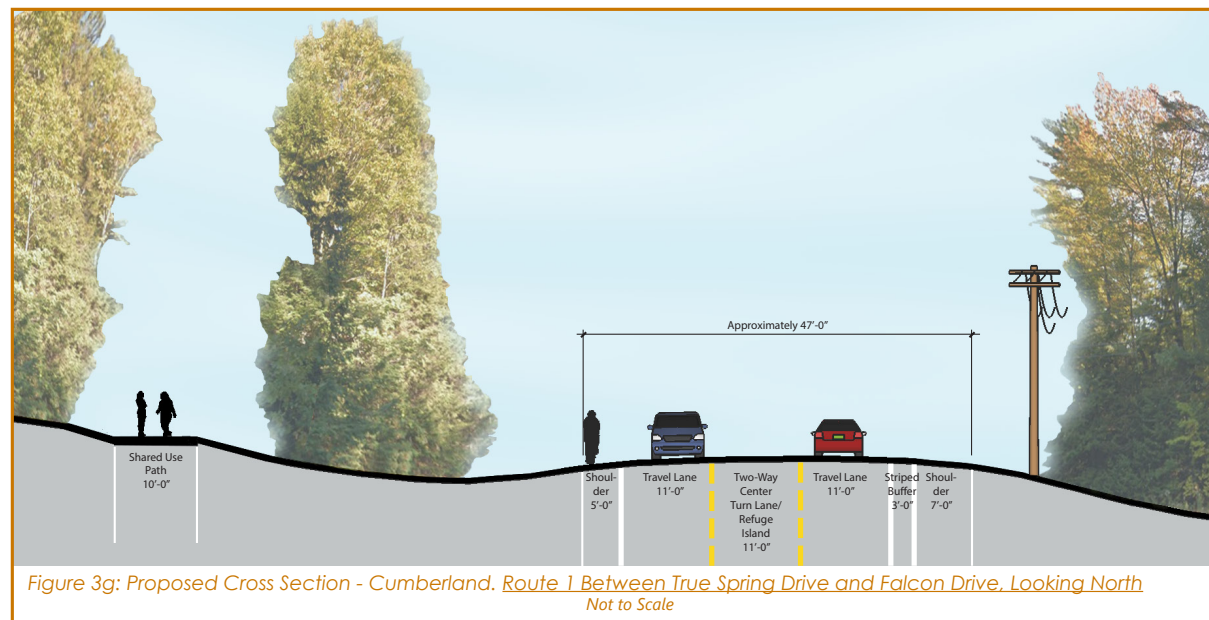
Proposed Cross Section - Cumberland. Route 1 Between True Spring Drive and Falcon Drive, Looking North. Not to Scale
